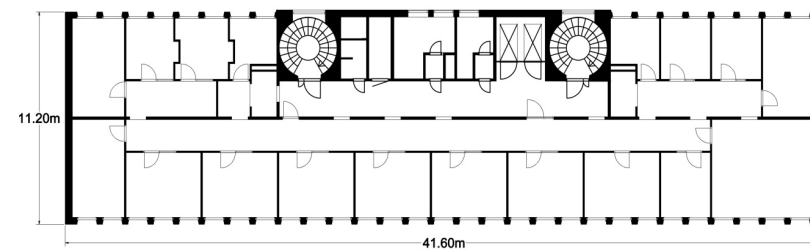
Typical floor plan with the cell offices facing south and the circulation facilities at the north part.
